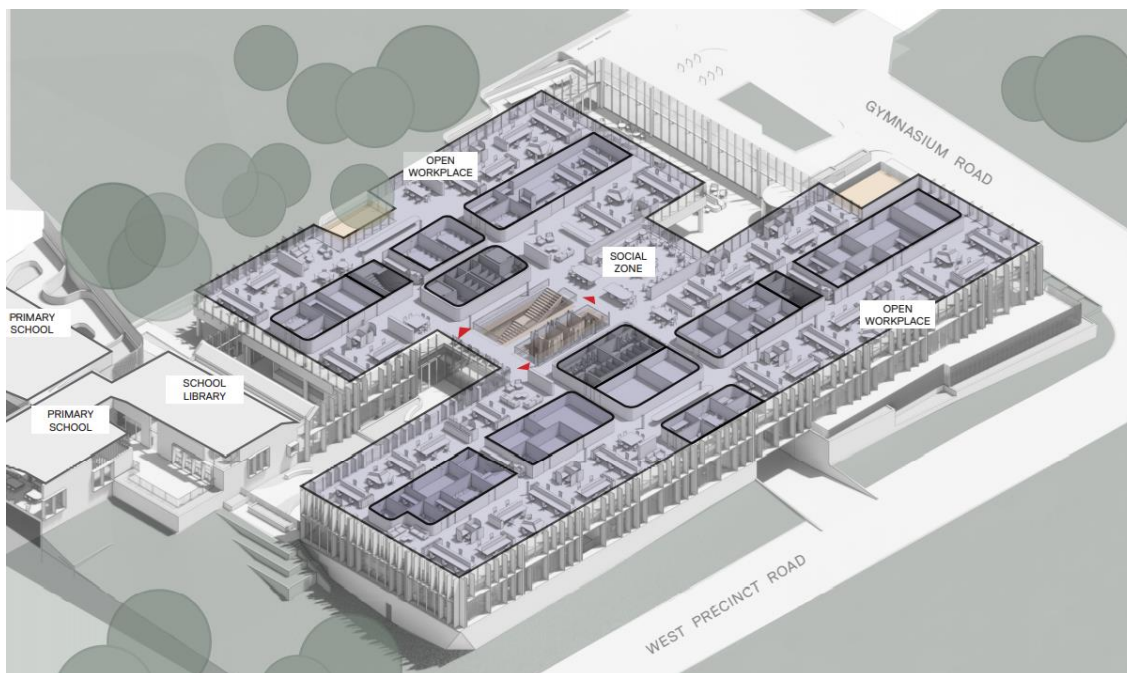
Open Workplace Overview Diagrammatic Plan (WMK)
